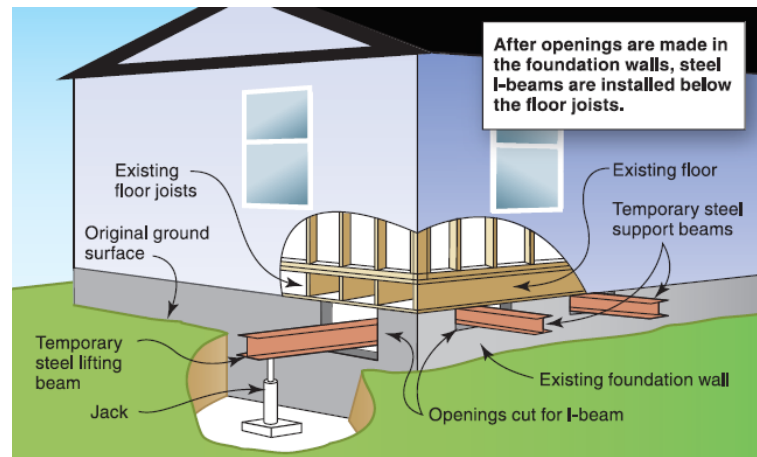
Jacks installed beneath the first floor of the home (FEMA)
